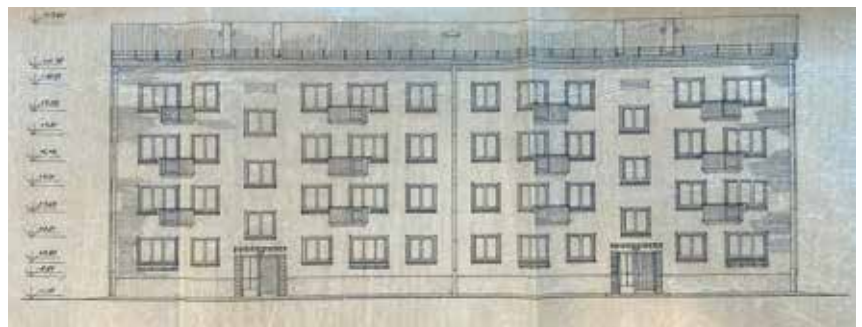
Facade of a residential building of the 1-316-1AK series standard project built of large-panel blocks (1960).
